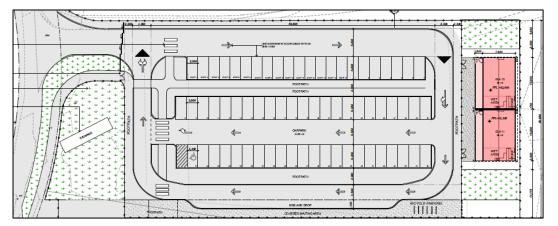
Existing parking layout (67 car spaces) (DA-456/2016) (Sources: JDH Architects & Bitzios)
